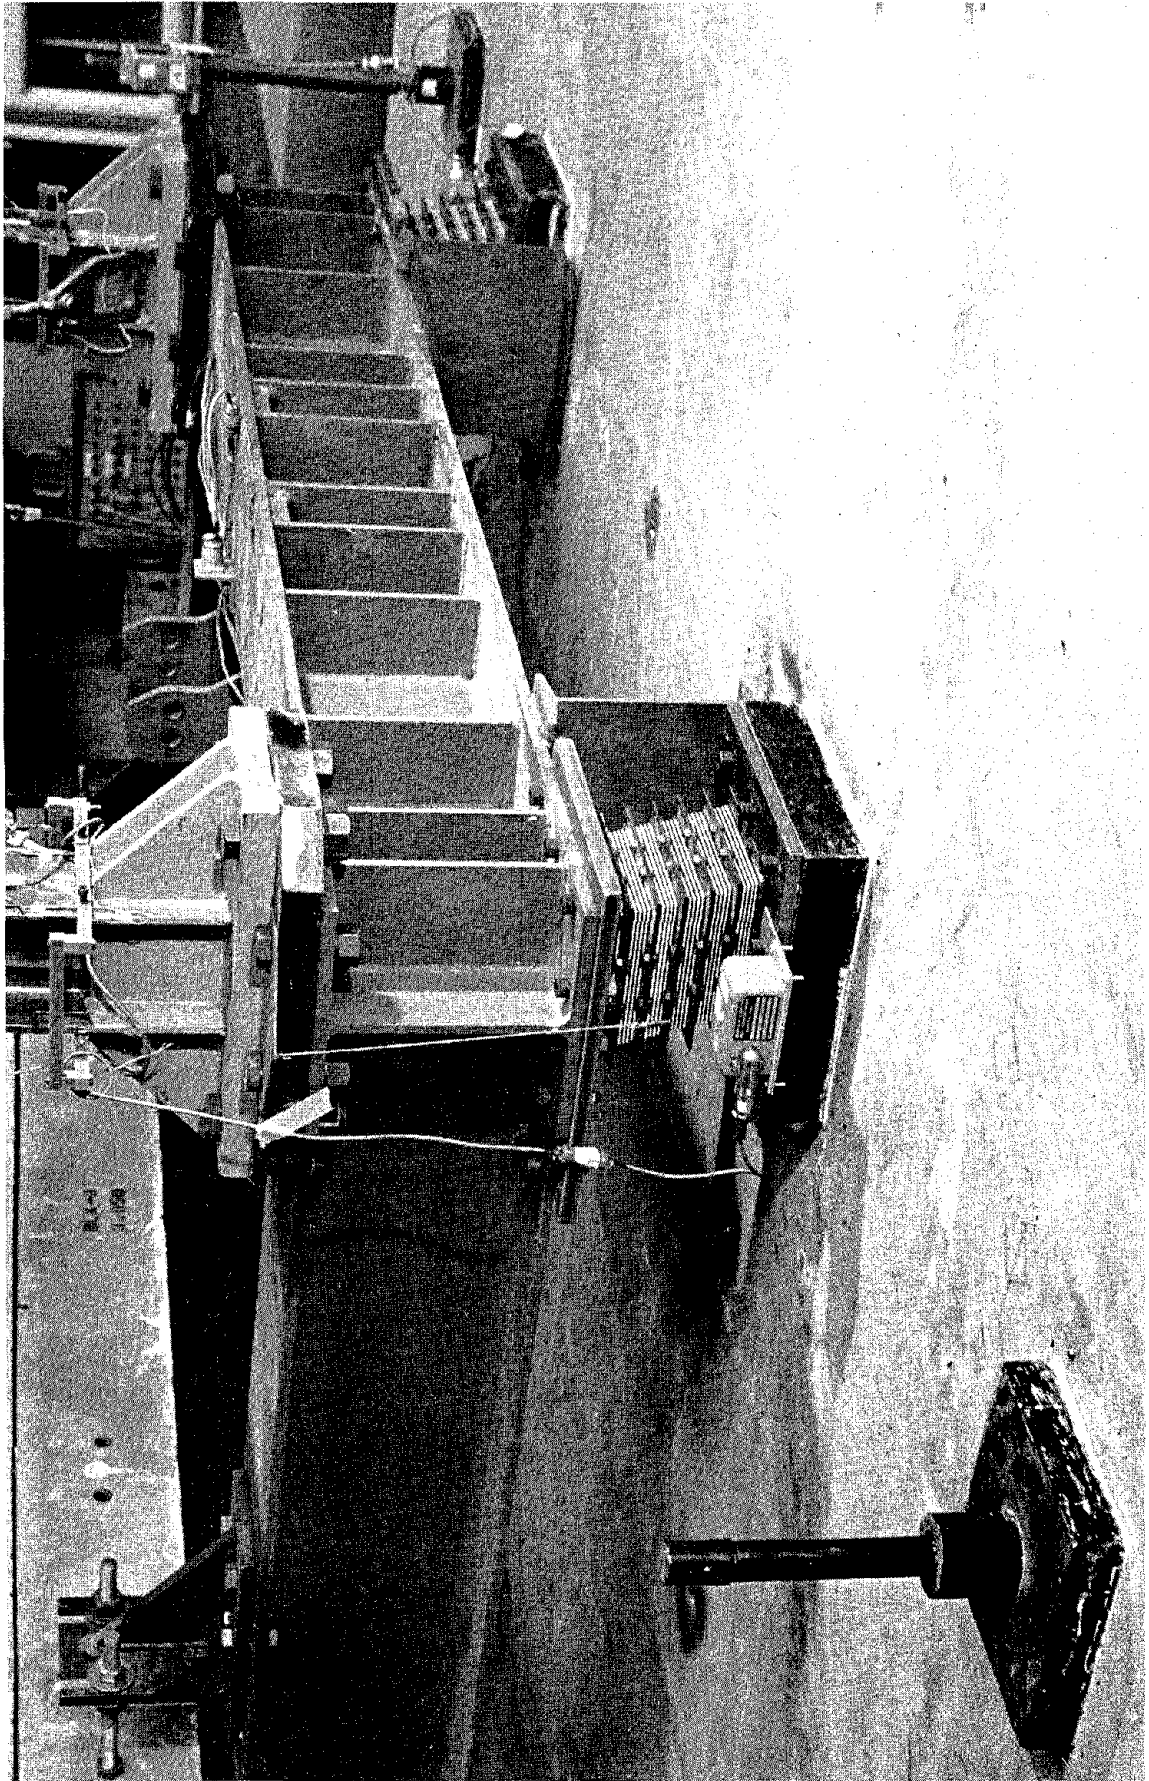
SHEAR DEFLECTION OF RUBBER BEARINGS
